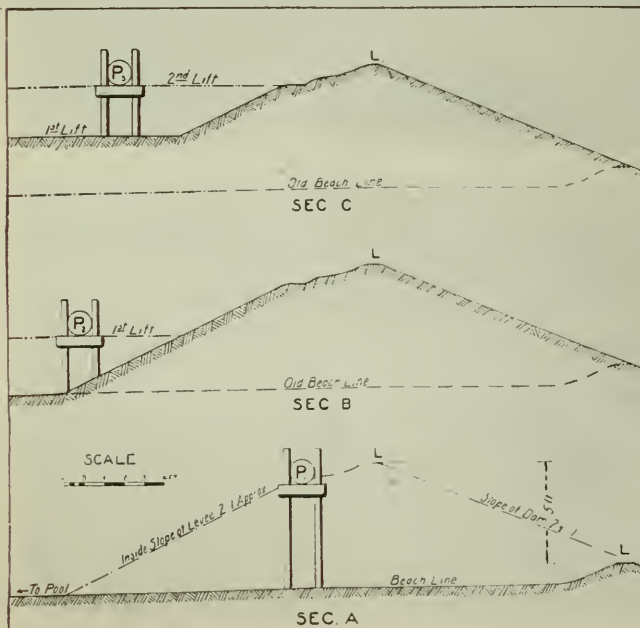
LEVEE CONSTRUCTION WITH WINDOW PIPE
